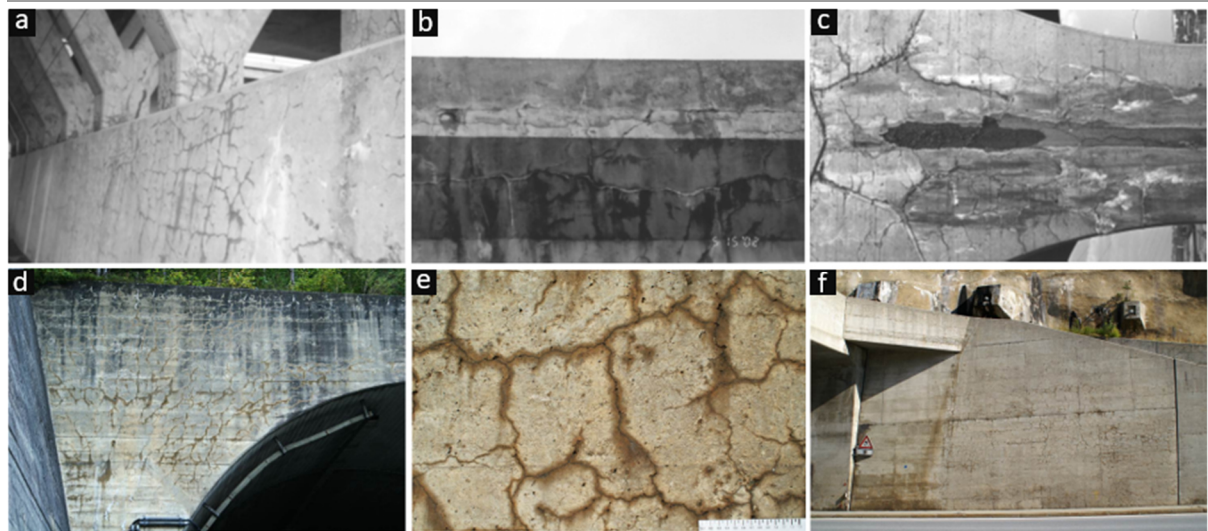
(a) ASR cracks on a road over-pass pier in Canada [76], (b) ASR cracking in an elevated freeway structure in South Africa [76], (c) severe ASR damage to a railway arch bridge in Johannesburg [76], (d) ASR cracks with dark rims having a preferred orientation parallel to the compressive stress at the entrance of a tunnel in Switzerland [78], (e) ASR cracks on a supporting wall (in Switzerland) [78] and (f) ASR cracks on a supporting wall at the entrance of a gallery in Switzerland [78].
